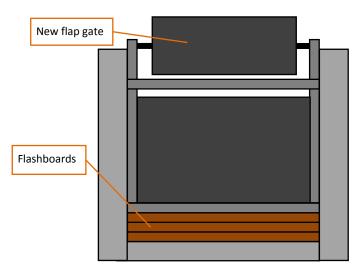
Conceptual front view of new flap gate structure in the Post B Canal (not to scale)
